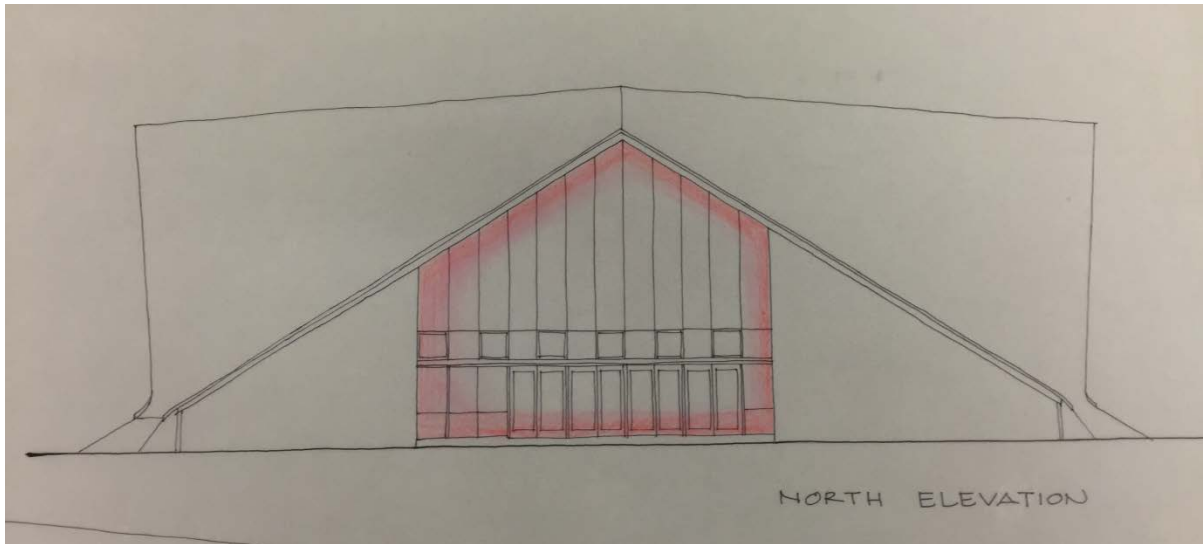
Drawing of the north elevation of the main hall building. MAC001-111-120
